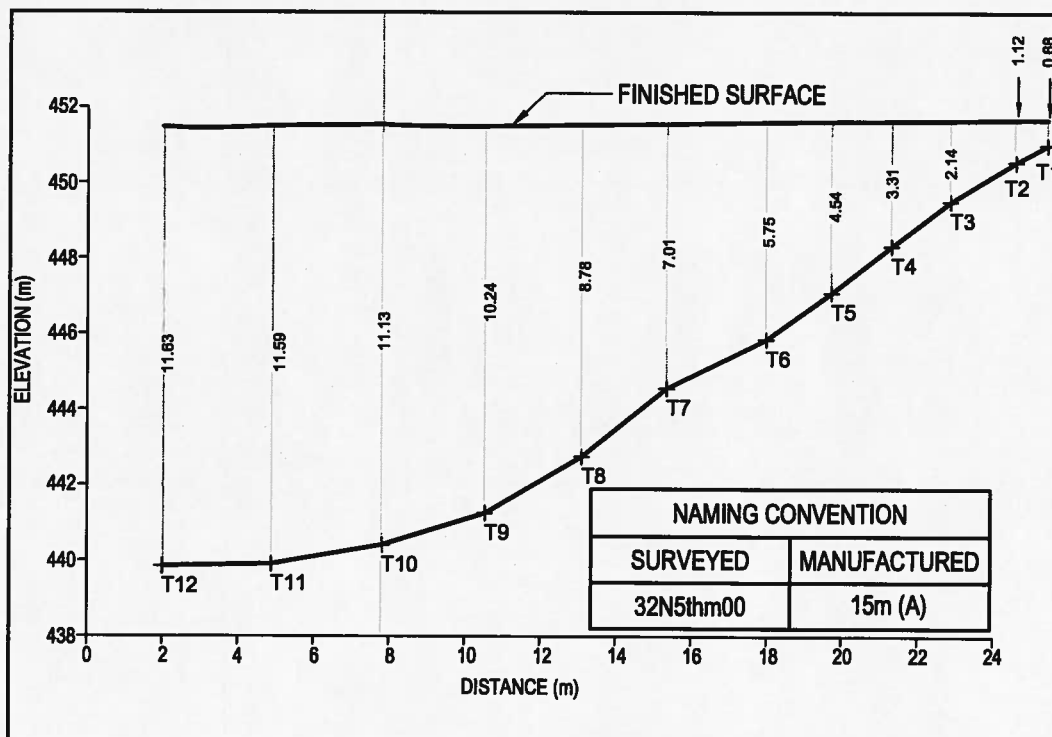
32N5thm00 (15m (A)) - AS MANUFACTURED, PLAN, AND SECTION
